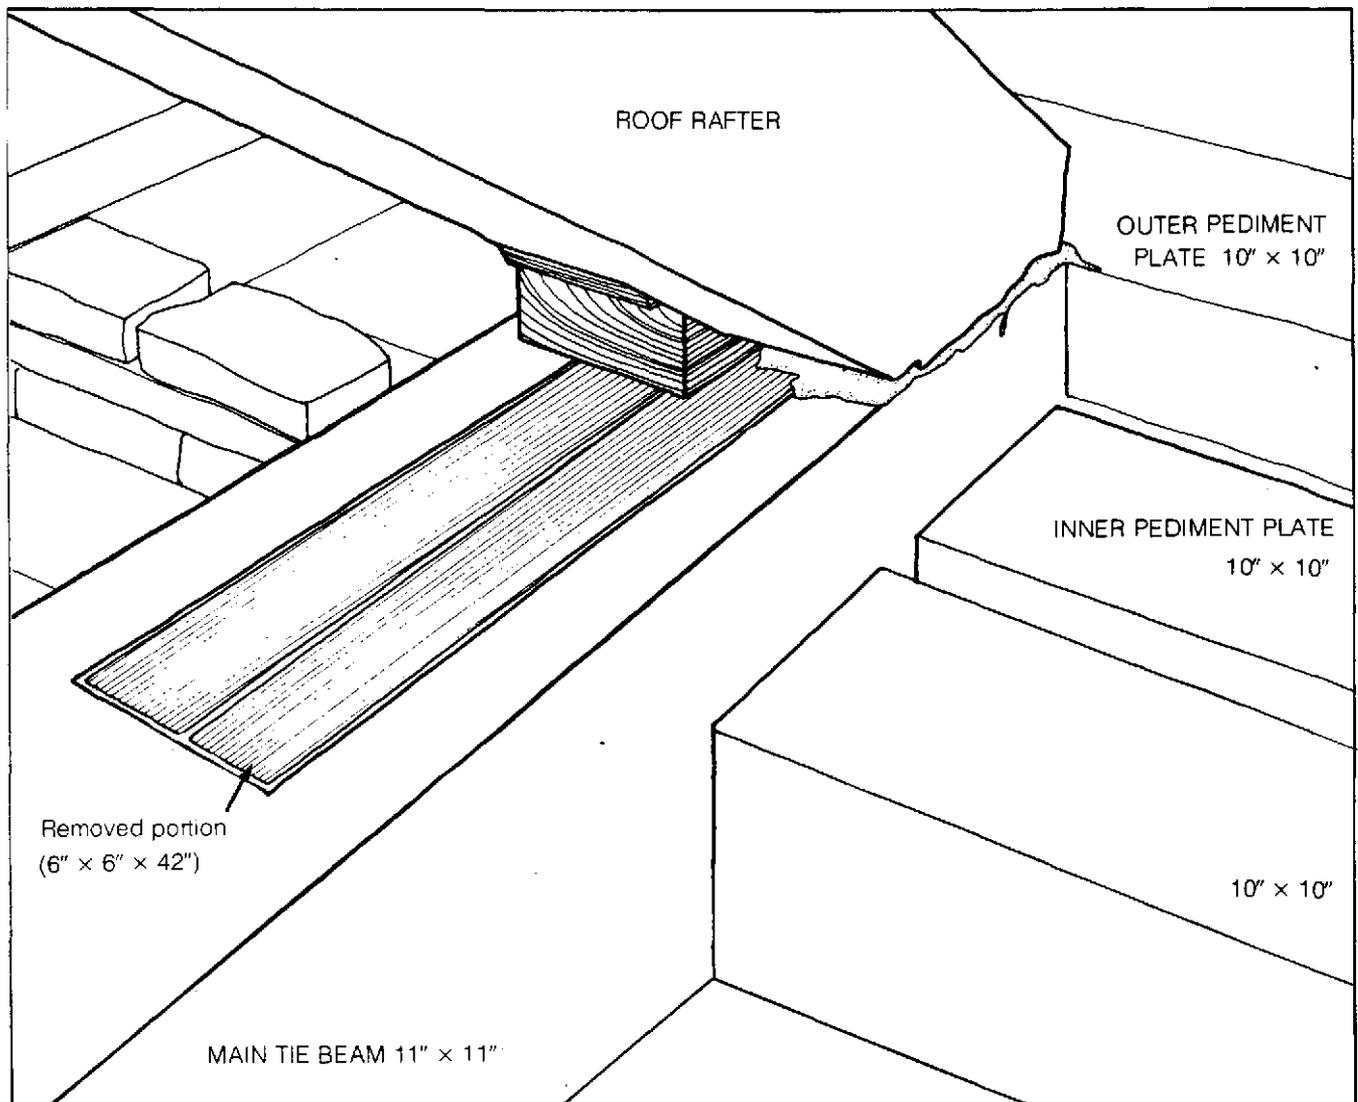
Framing isometric of the Longfellow House central pediment. Note that the damaged area includes the tenon that formerly connected the rafter to the tie beam. The outer pediment plate is supported by the cantilevered end of the rotted tie beam. Thus, before the repair, the support for the outer pediment plate was very poor.
